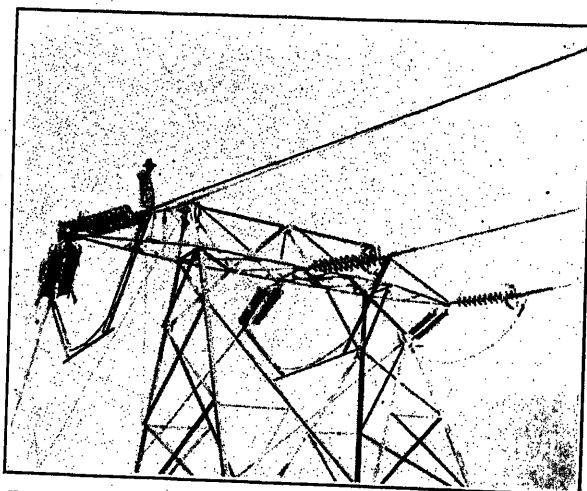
ERECTING SHIELD RINGS ON DEAD-END TOWER
